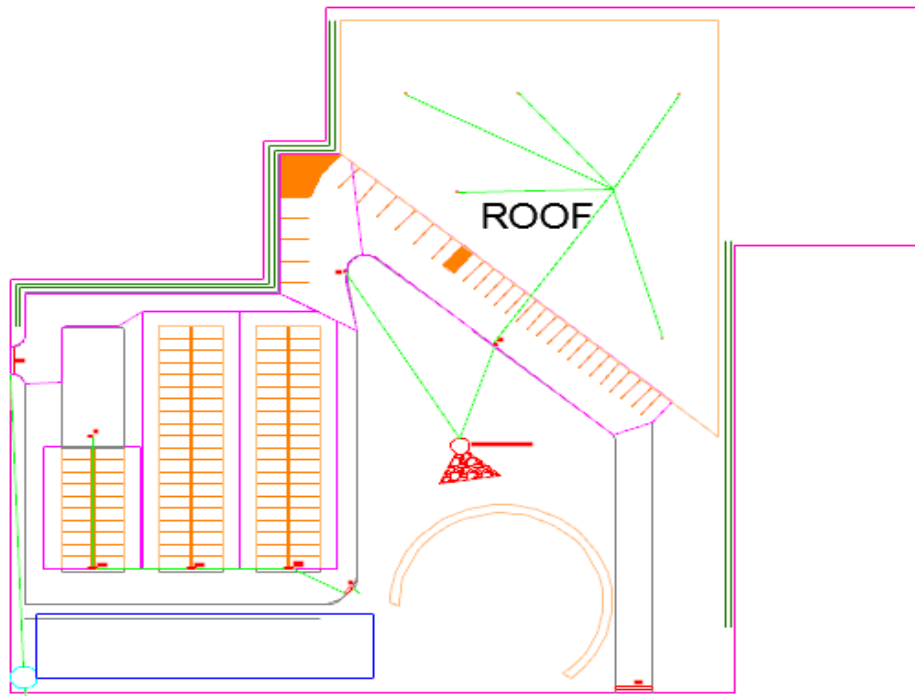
Schematic diagram of one of the four site layouts used for the small commercial site showing the trapezoidal building in upper site, porous pavement parking lots, and a semi-circle infiltration trench and detention pond in bottom site..
